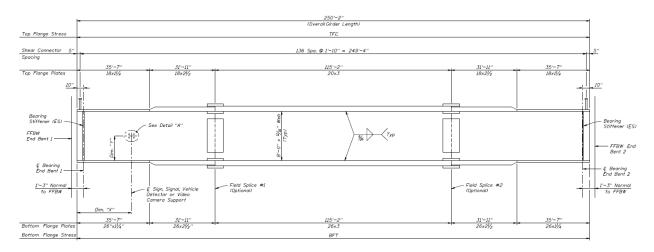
Typical Details of Girders of the Bridge SR-589 over Waters Avenue
